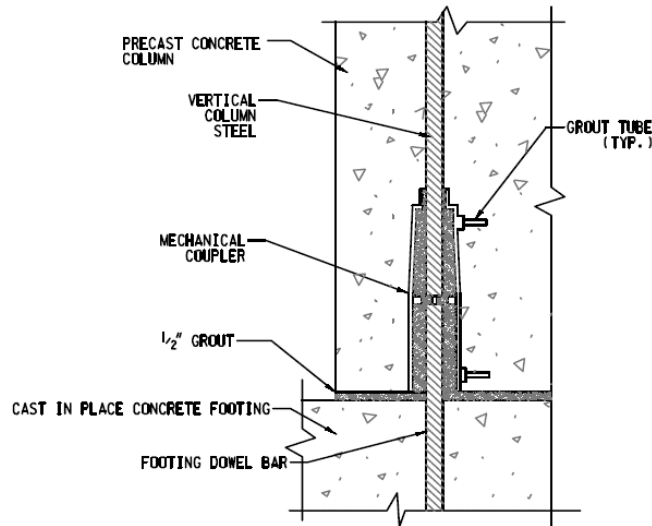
Precast column to CIP footing connection (FHWA 2009)
